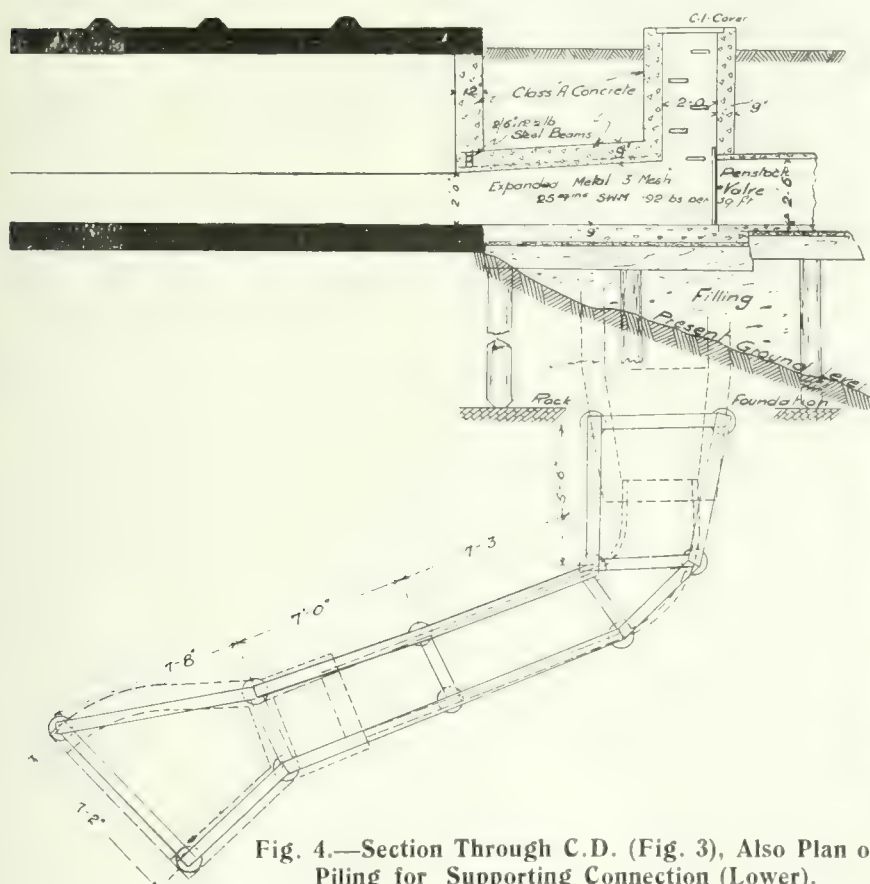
Section Through C.D. (Fig. 3), Also Plan of Piling for Supporting Connection (Lower).
